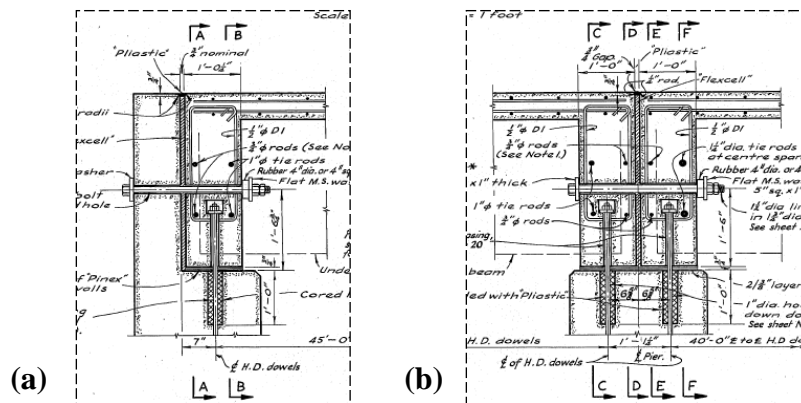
Detail from the drawings of the connection (a) between the deck and the abutment and (b) between the deck and the pier
